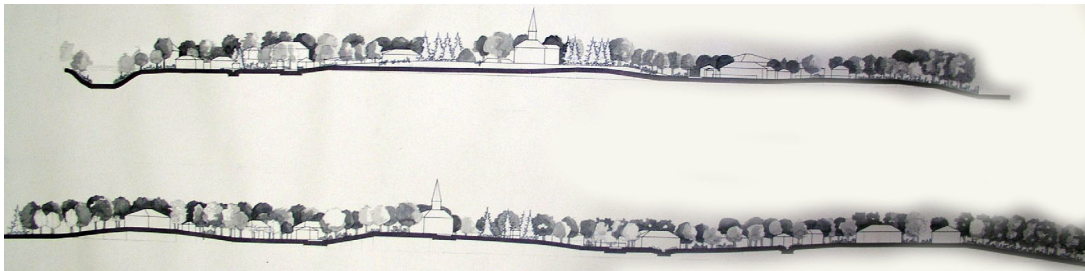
Sections through new area from the proposal layout for the revitalization of the „Village and Folk Art Museum” in Bucharest
